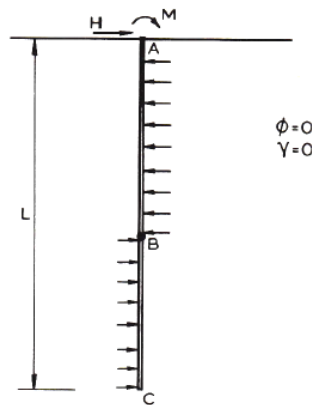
Pile under horizontal load simplified as a cantilever (Tomlinson and Woodward 2008)
